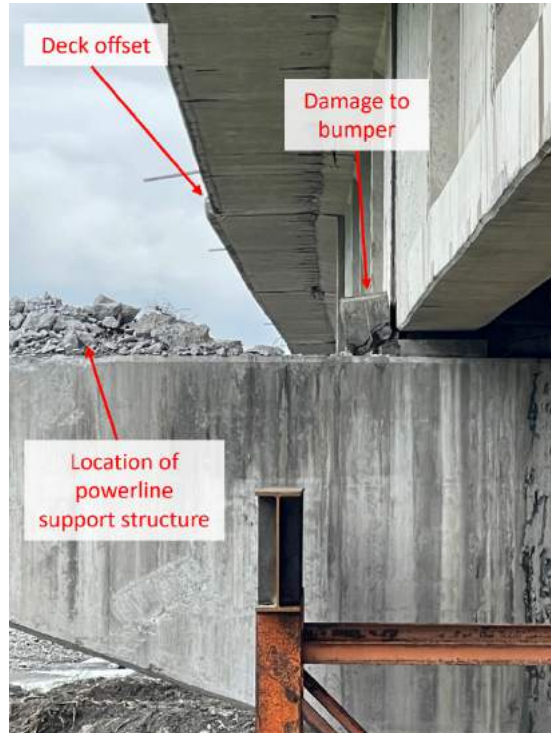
Typical damage to a concrete bumper shear key, offset of bridge deck, and location of concrete powerline support structure. (23.27481° 121.30502°)
